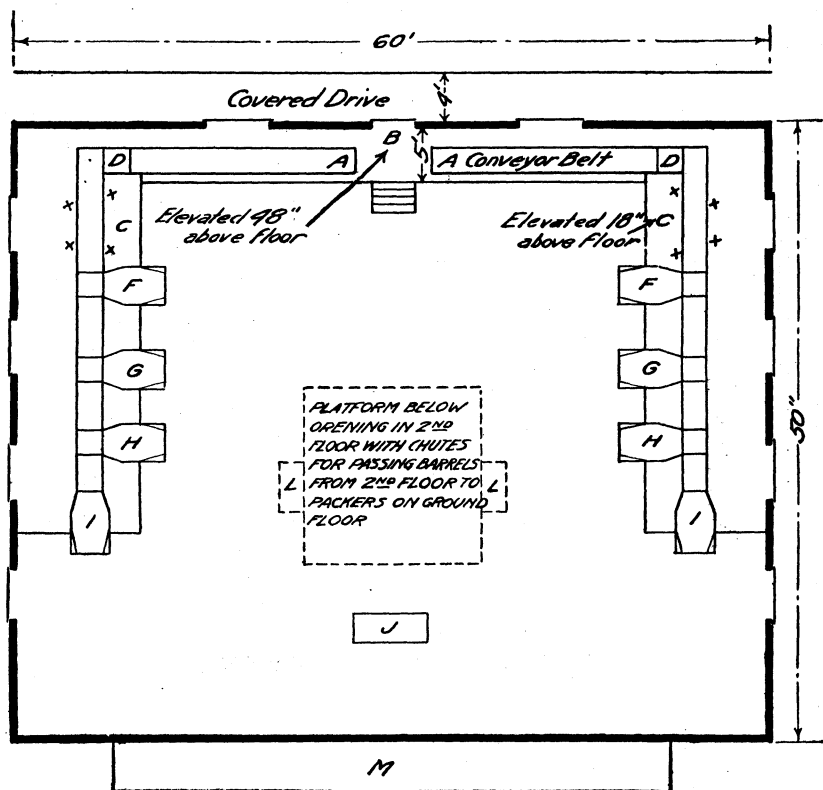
Plan 3: Floor plan of a well-arranged house capable of handling 1,000 barrels daily
